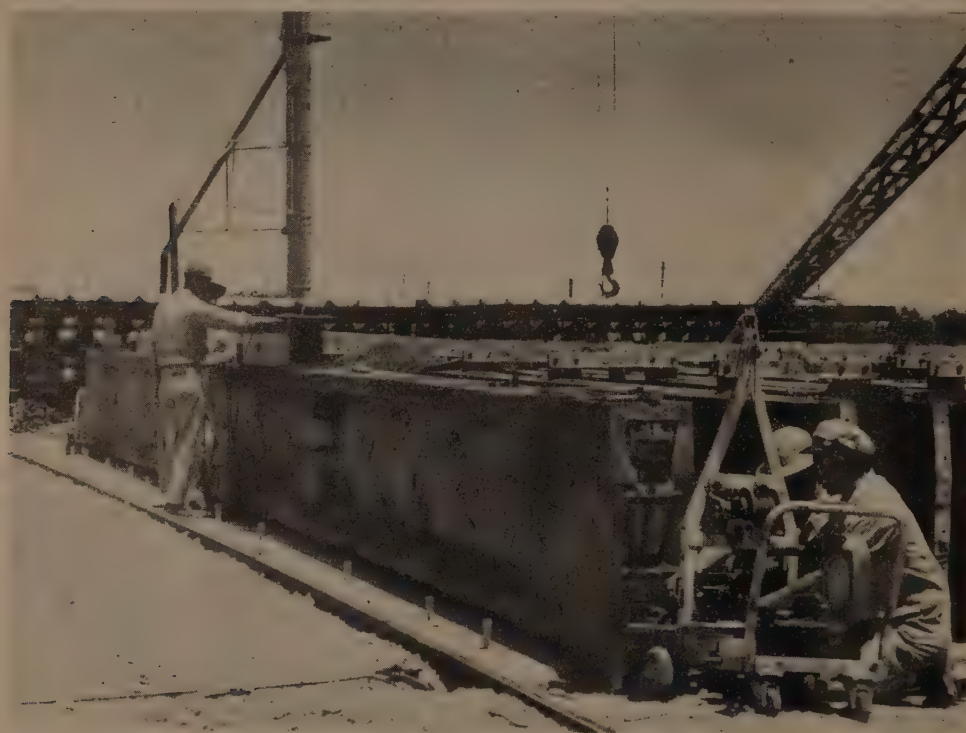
Lower Tampa Bay Bridge, Florida—Test girder during stressing operation
